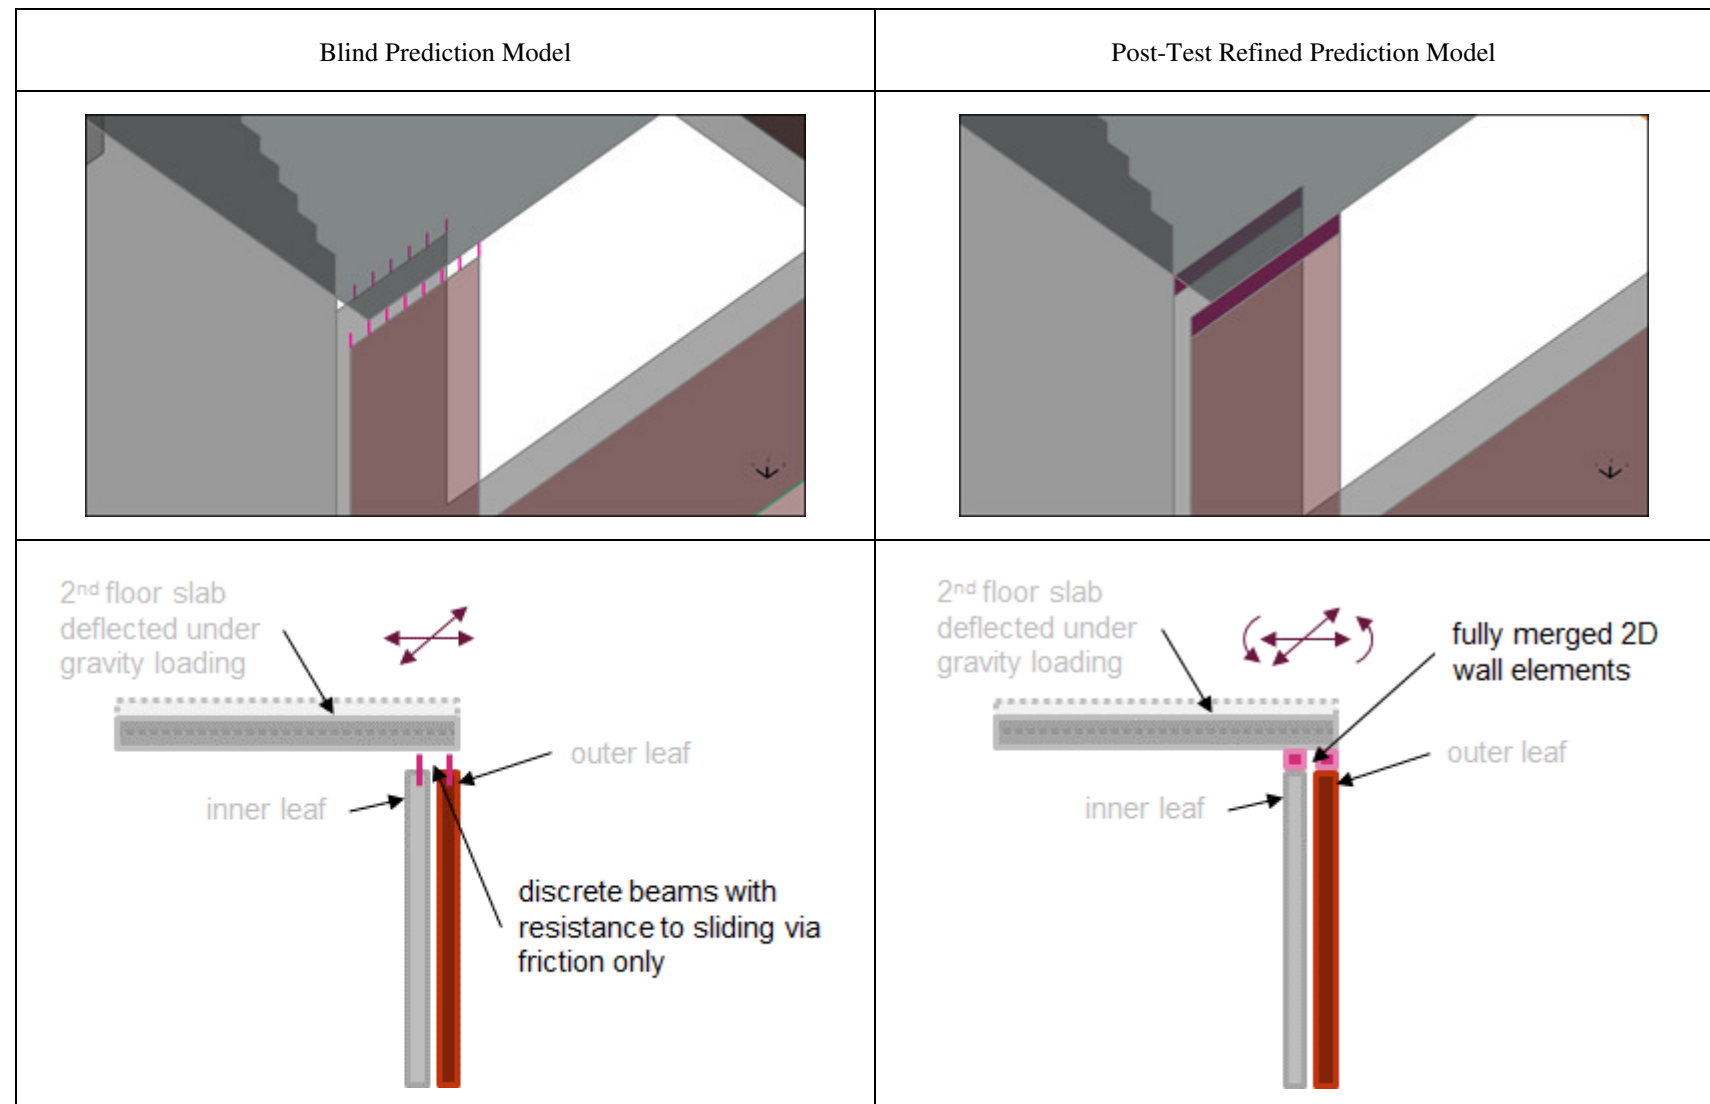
Change in connection between second floor slab and East/West walls in LS-DYNA post-test refined model
